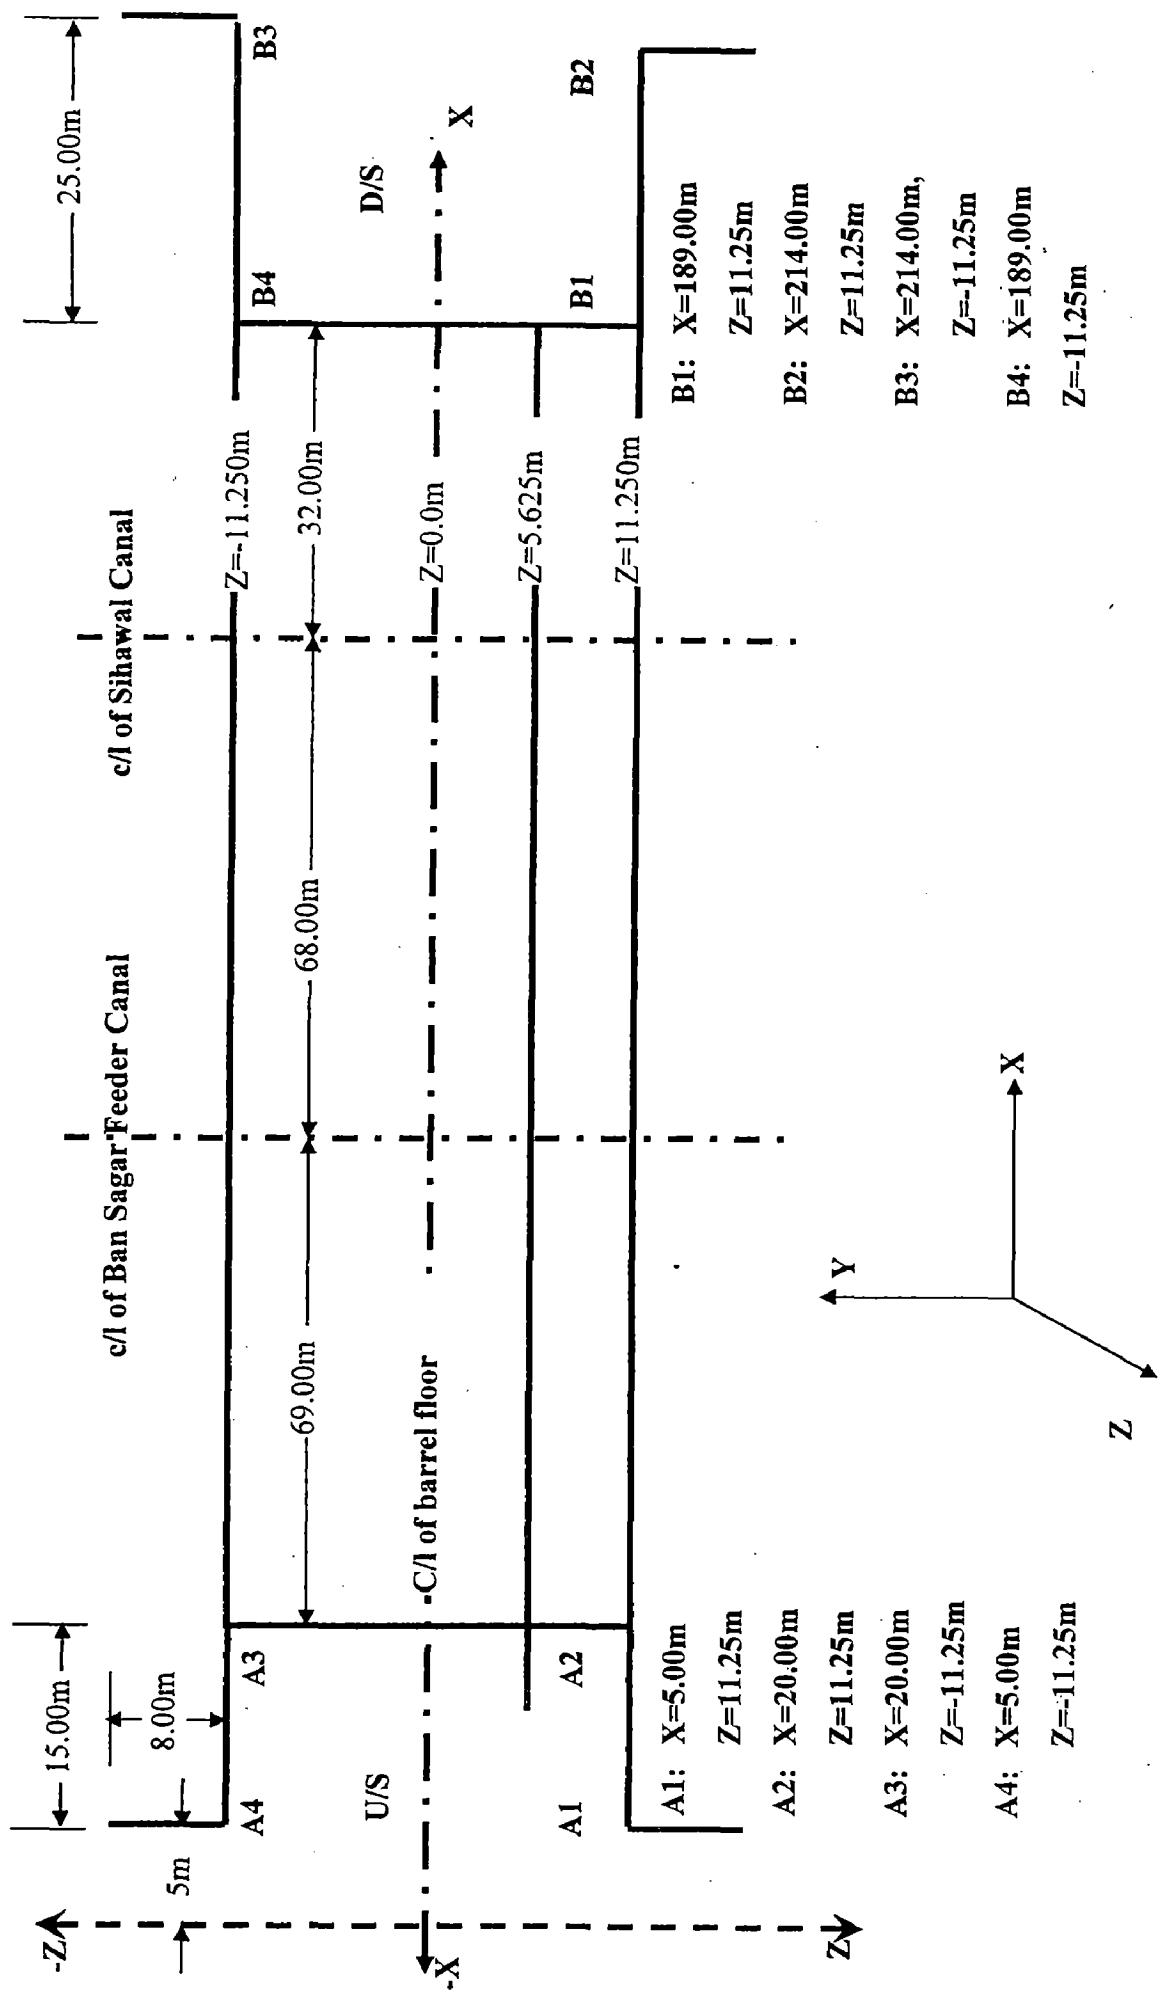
PLAN OF BARREL FLOOR AND CUT-OFF
